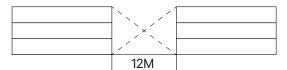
A 1:1 ratio where the street wall is equal to the width of the street.
